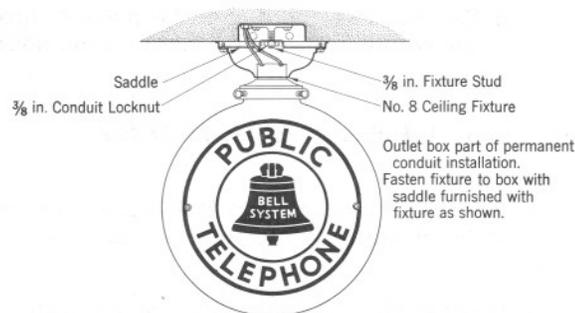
No. 8 Sign — Ceiling Installation — Other Surfaces
